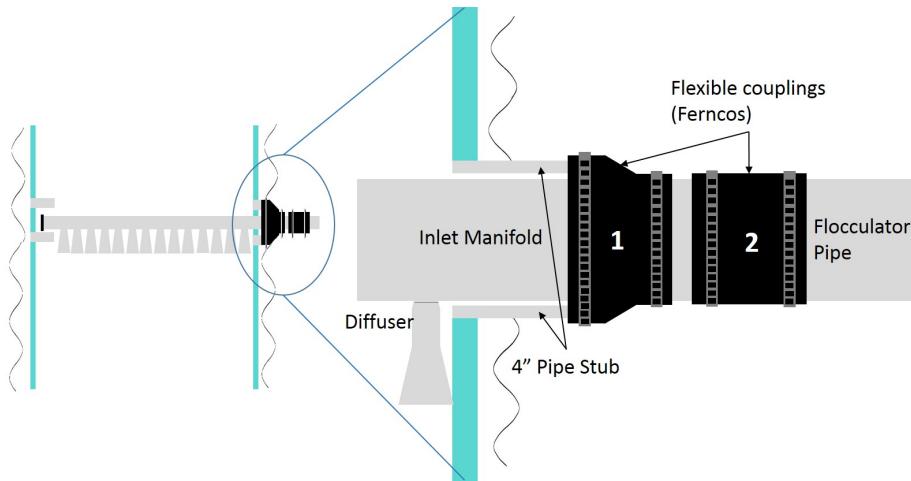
Connection between inlet manifold and flocculator. The flocculator pipe is connected to the inlet manifold pipe via fernco 2 (as shown in figure). A 4 inch PVC pipe stub is welded to the tank wall, and the inlet manifold is attached to the stub with fernco 1, a 4" to 3" reducing fernco.
